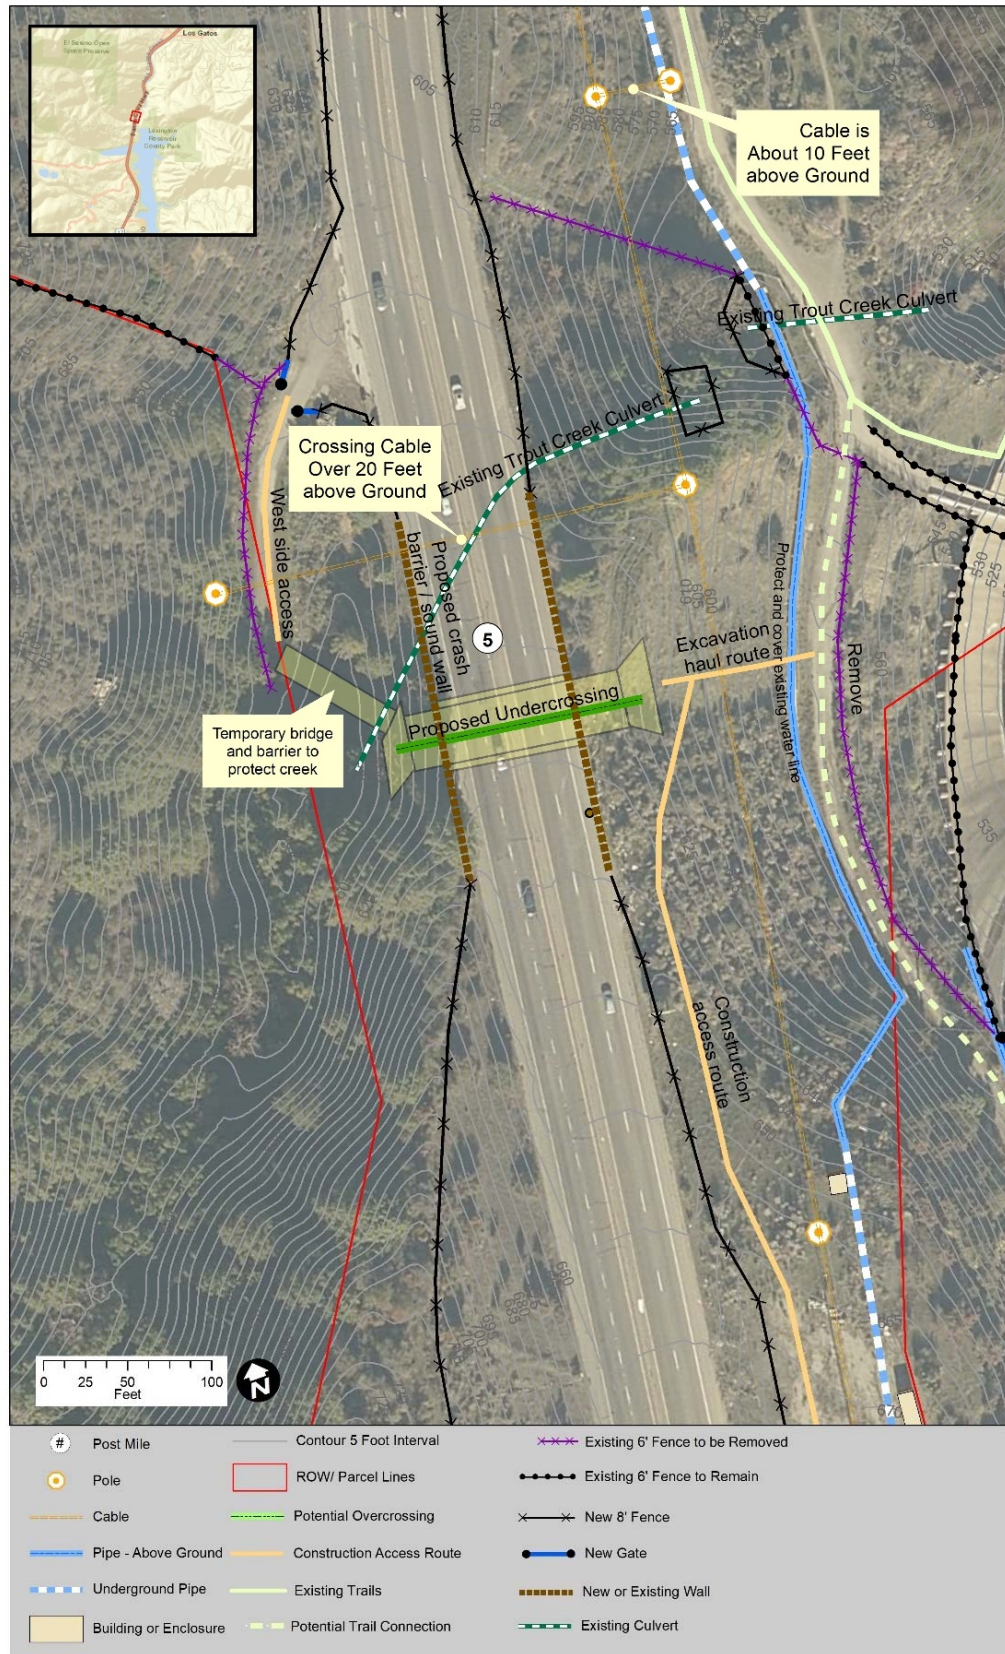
Site Area - Alt. 2, Trout Creek Wildlife Undercrossing
